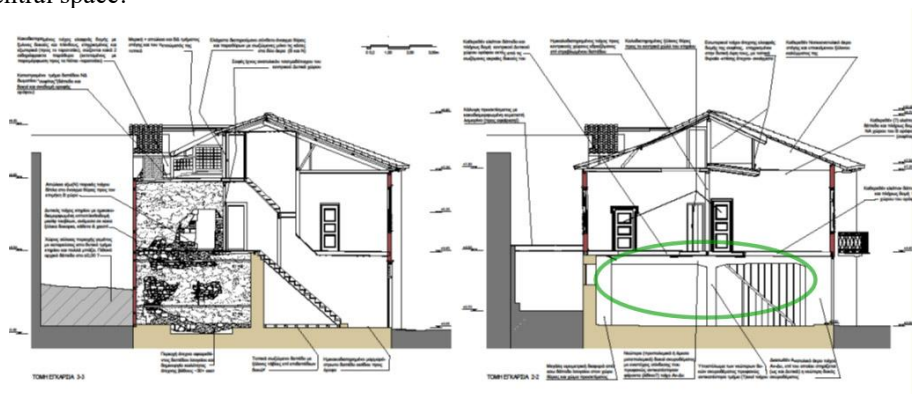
Transverse Sections of Terzaki, showing Ground floor, 1st floor, and Attic floor (B) (the green ellipse, on where the newer reinforced concrete beam and pillars had been put, to expand ! ground floor shops area !!!)
